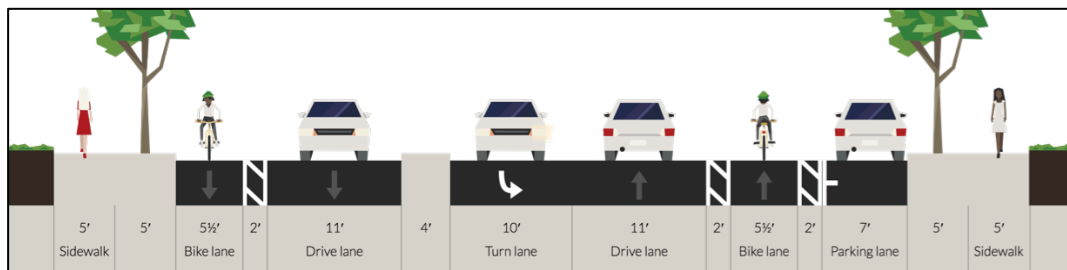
60-foot paved width with buffered bike lanes, one-side parking, center lane
